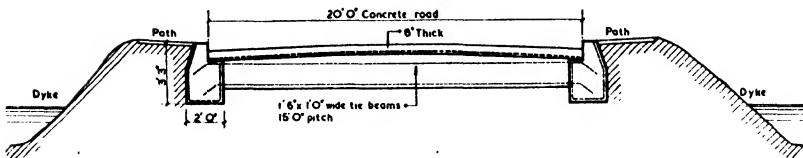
HAUNCHES TO STRENGTHEN AN EXISTING ROAD.
